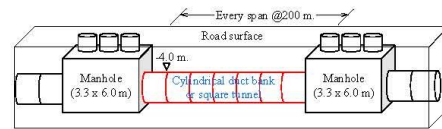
Construction of the underground power cables in Thailand by using the pipe jacking method
